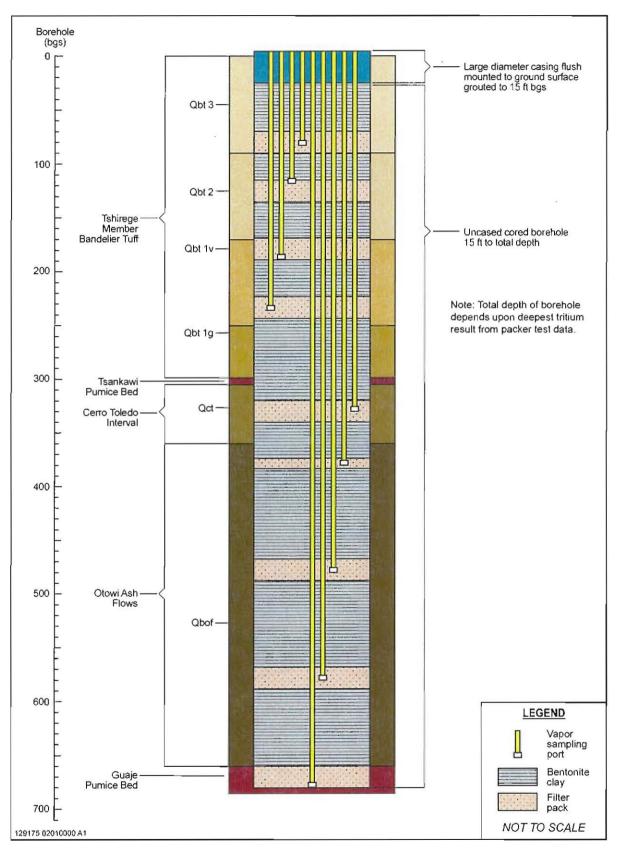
Proposed vapor-monitoring well construction details, location 21-25262
